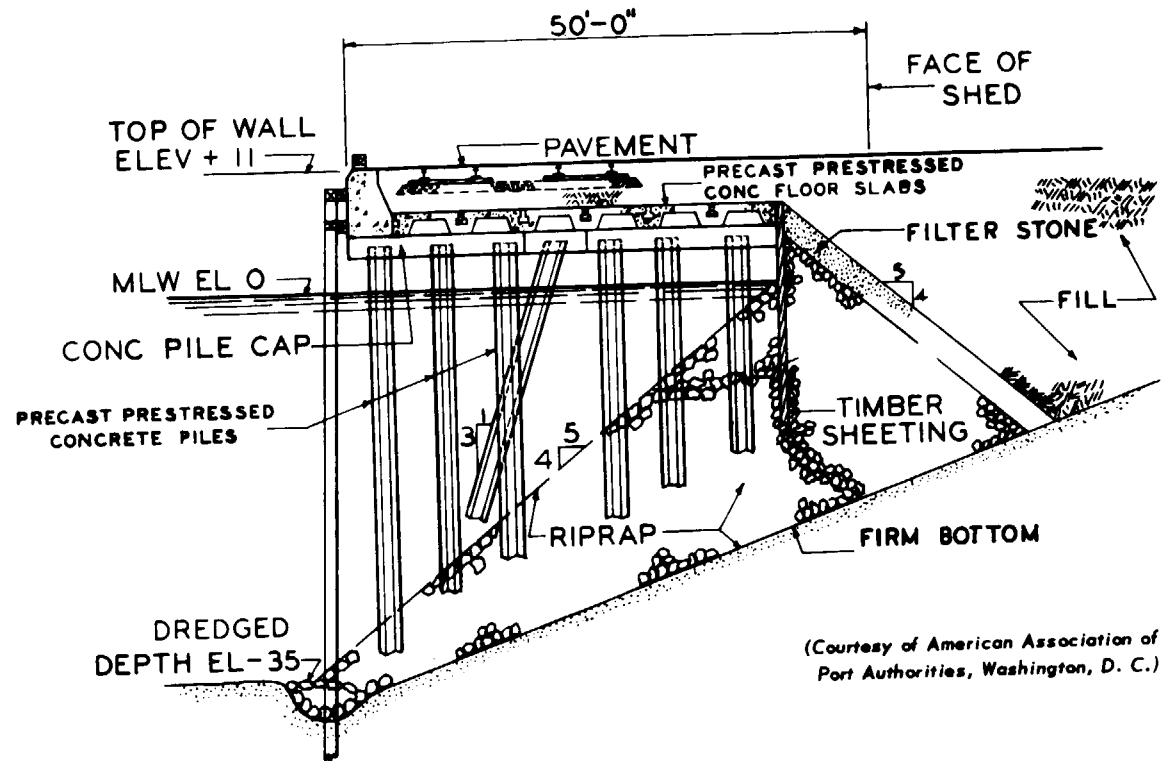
Open-Type Wharf Construction with Concrete Relieving Platform on Concrete Pile.
